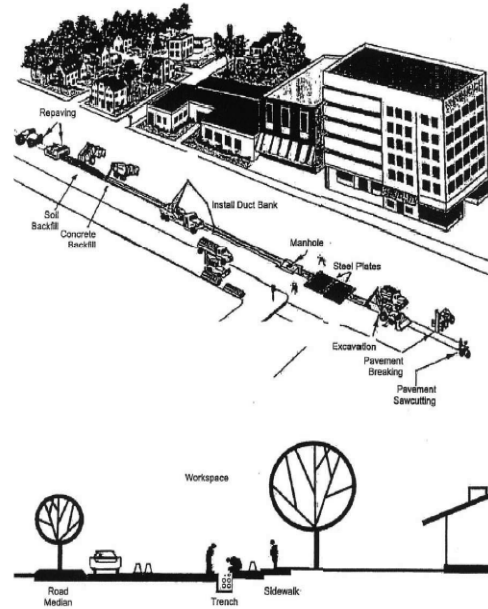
Typical Underground Construction Steel Process within Roadways
